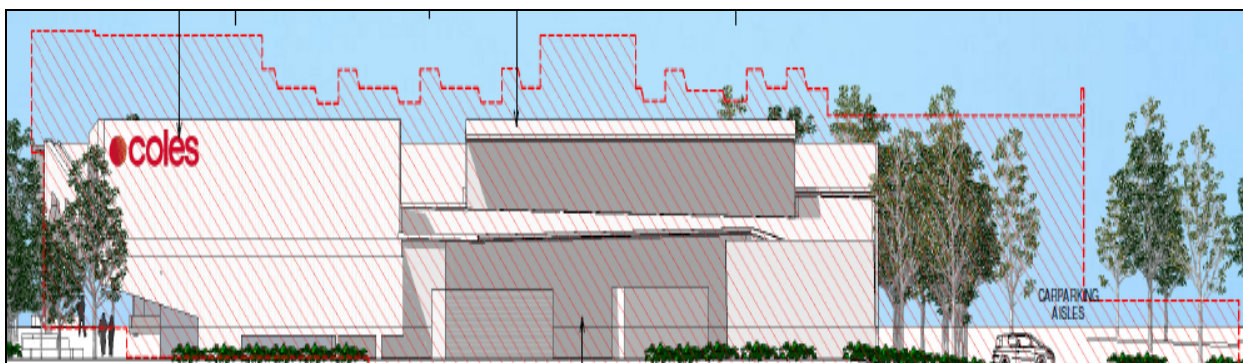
Western Building Facade – View from Tweed Coast Road (excludes landscaping) (source: proponent)
